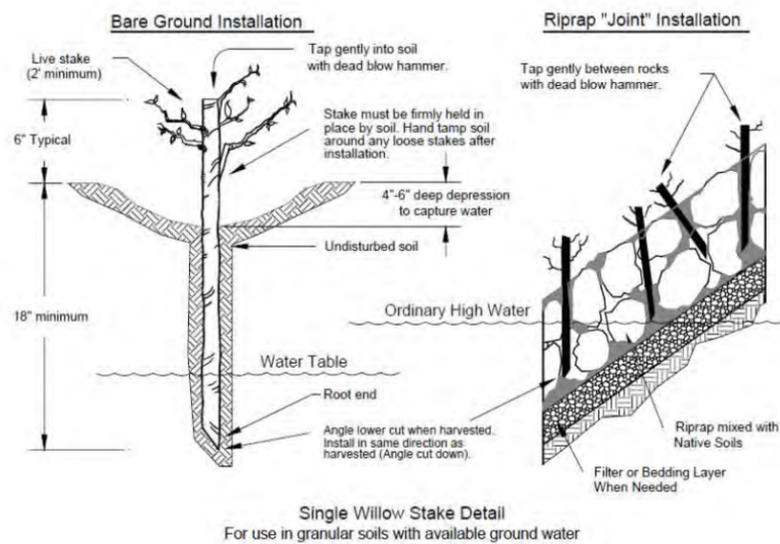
Typical Detail for Single Willow Stake (UDFCD 2001).
